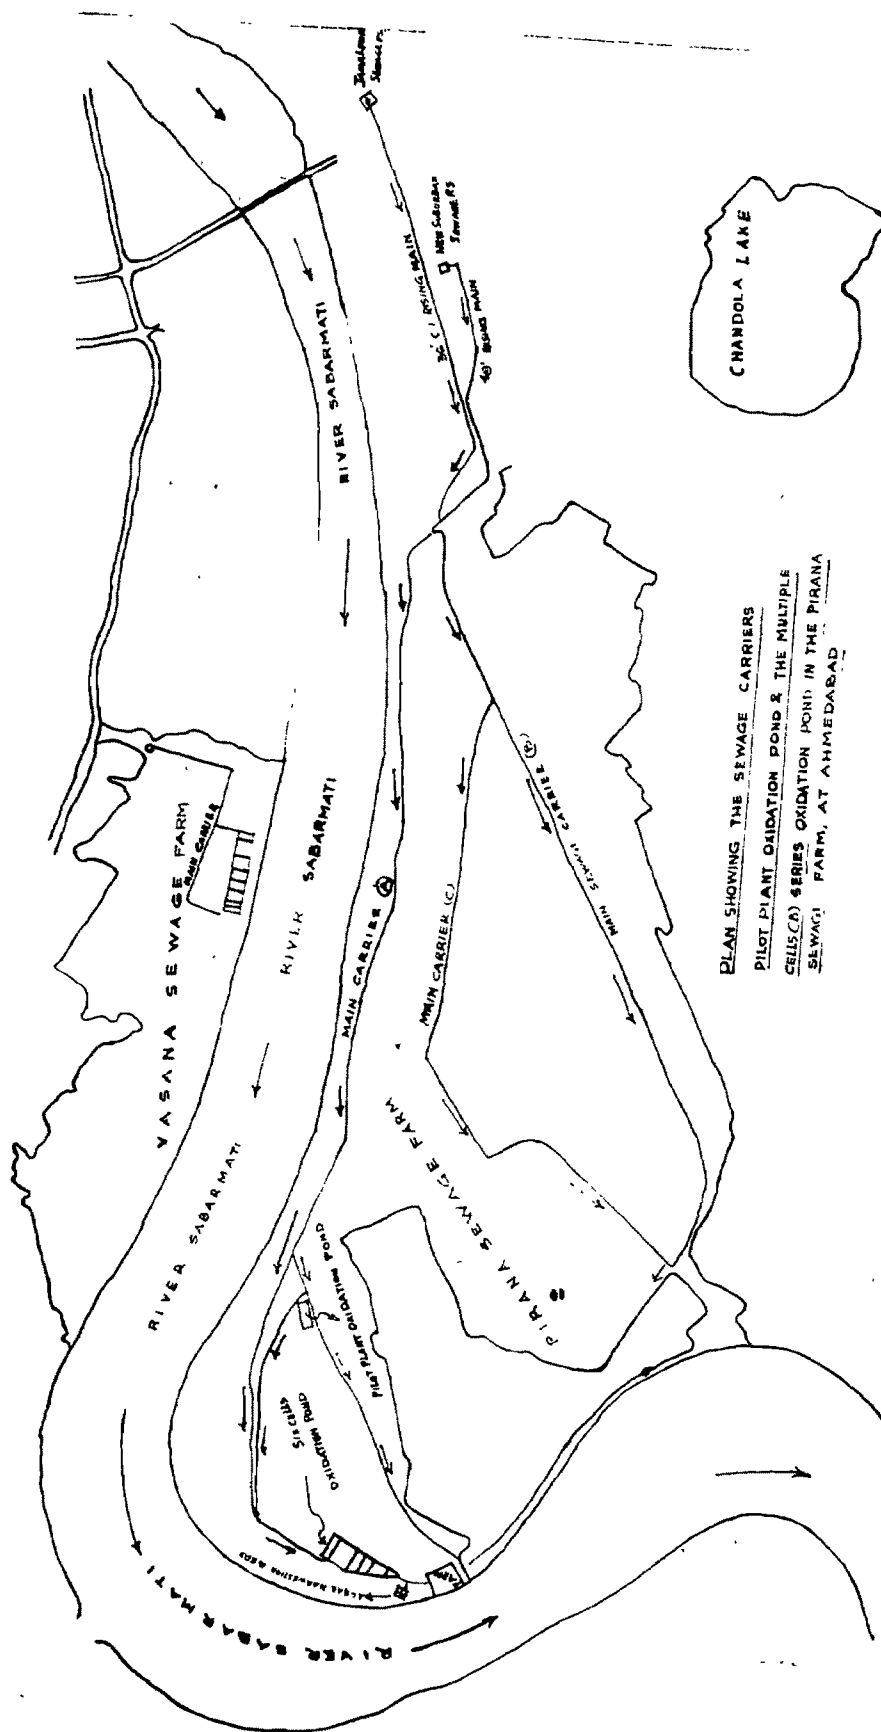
Plan showing the sewage carrier Pilot-plant oxidation pond and the multiple cell series of oxidation ponds in the Pirana Sewage Farm.
